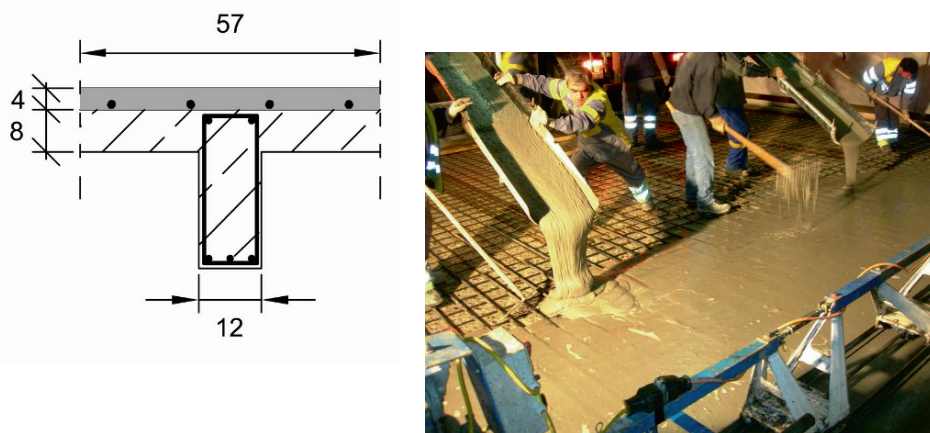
Cross section (dimensions in cm) with UHPFRC layer (in grey) and view of UHPFRC casting performed in autumn 2007
